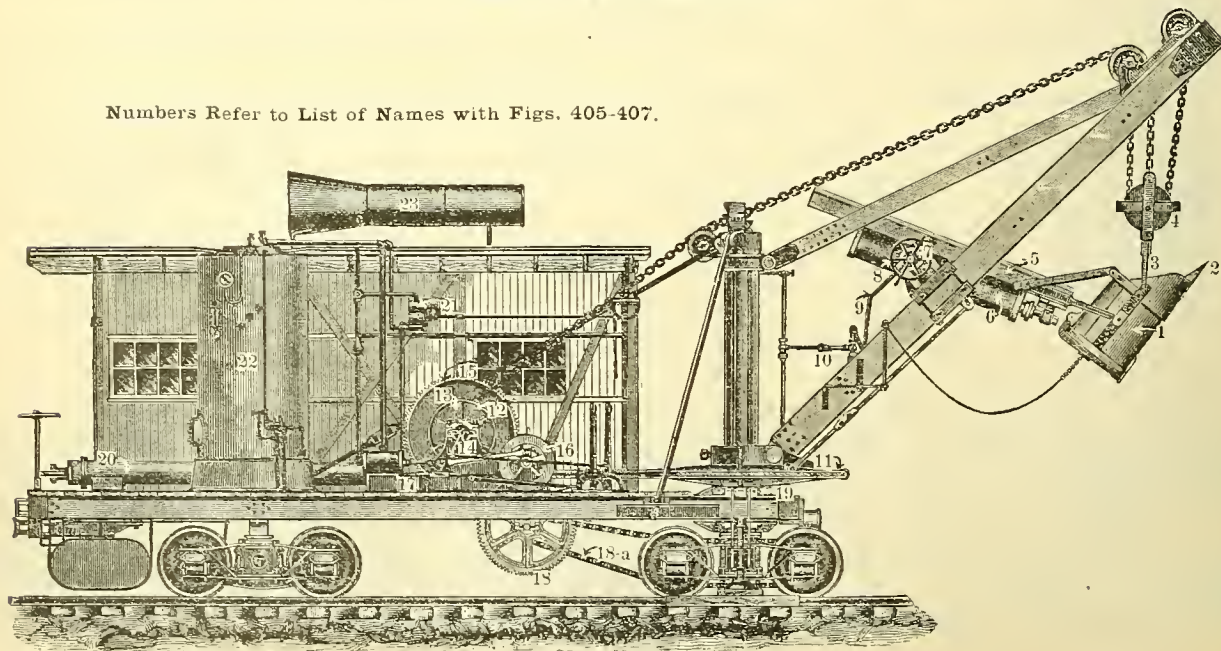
STEAM SHOVEL. INDUSTRIAL WORKS.
